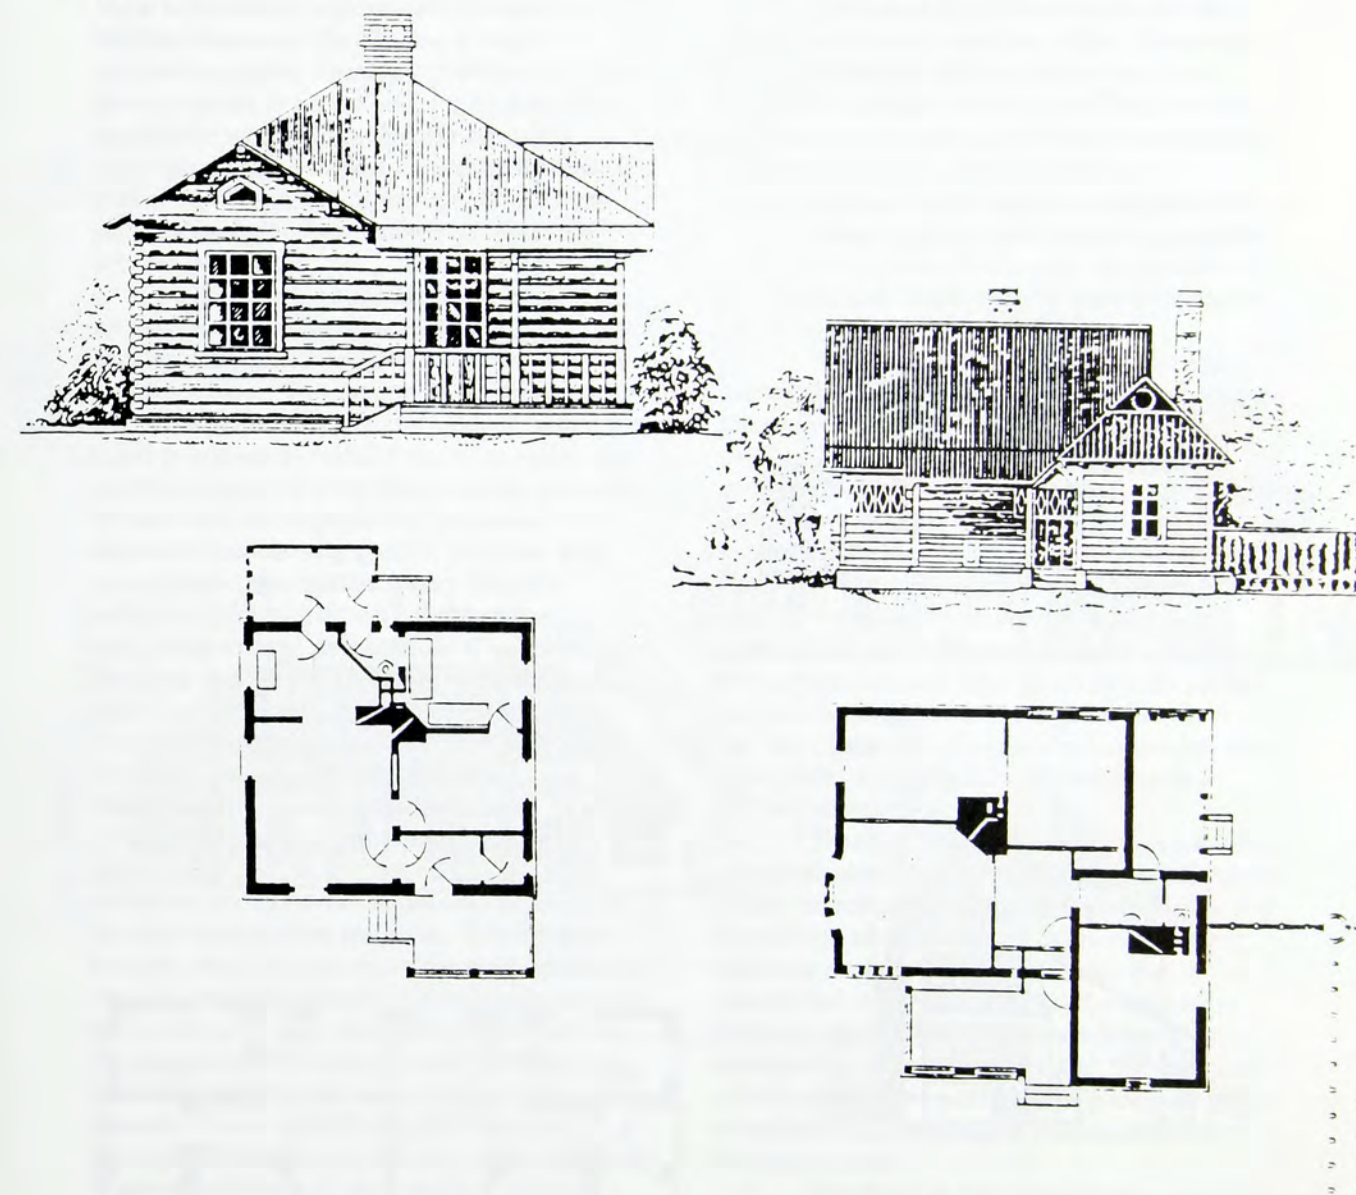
Plans and elevations for proposed dwellings, Prozorovskaya, 1913
